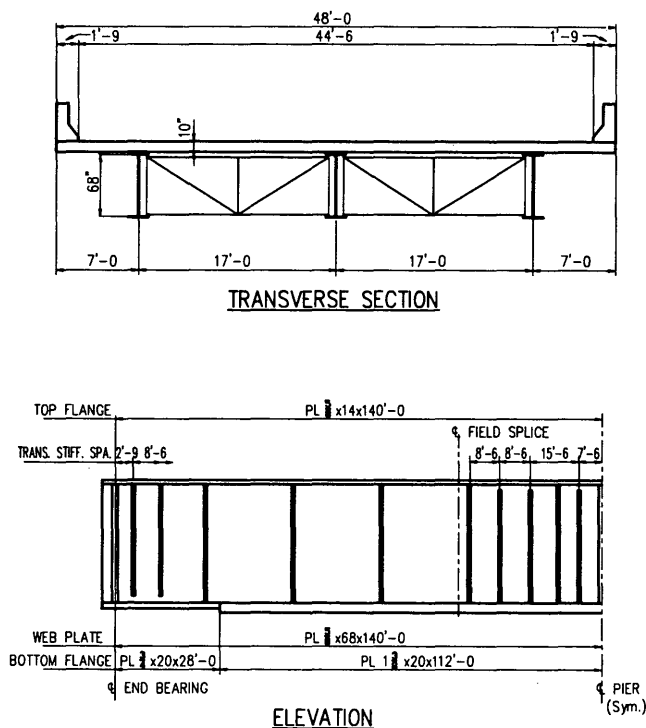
Prototype of model bridge tested at FHWA Turner-Fairbanks Laboratory.
